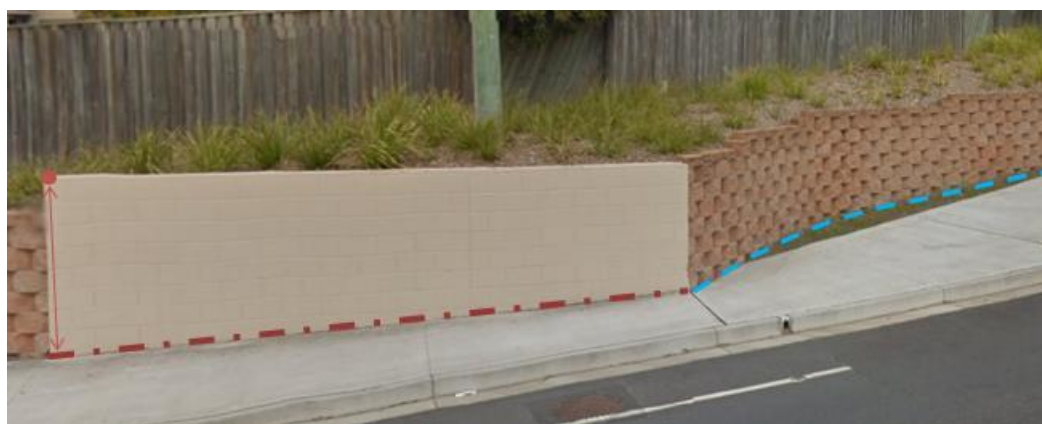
Typical example of Retaining Wall ADAC data capture.
